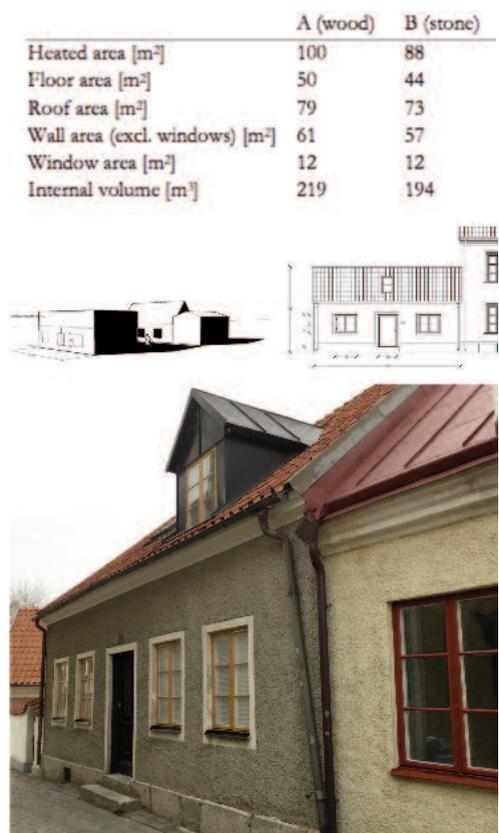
Typical building 2; its geometries and the medium sample building.
